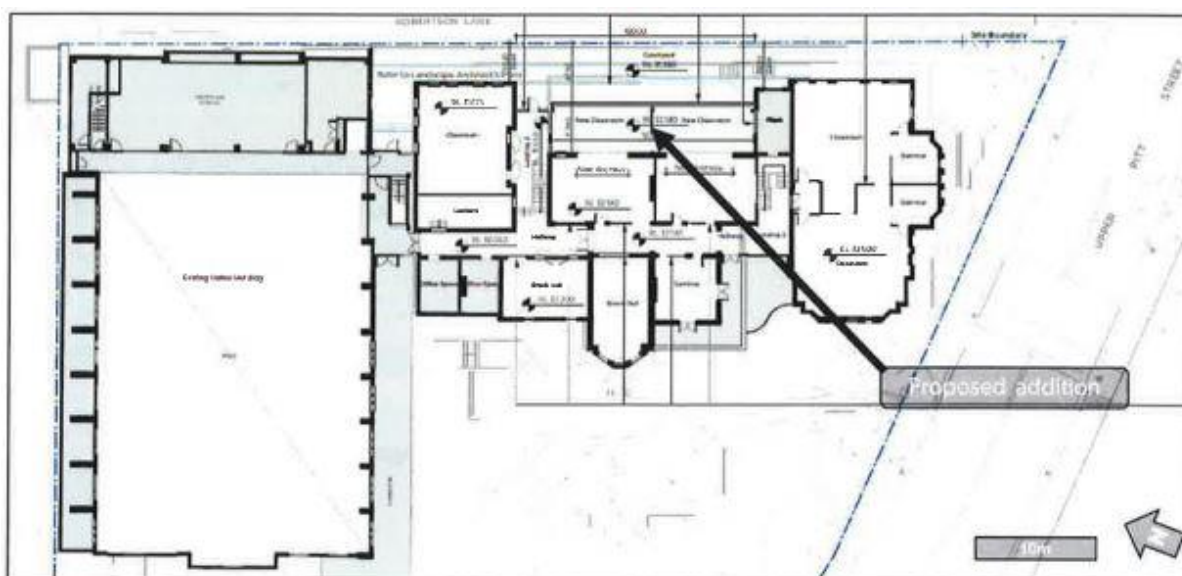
Senior Campus Concept Plan layout (Source: Applicant's EIS 2018)
